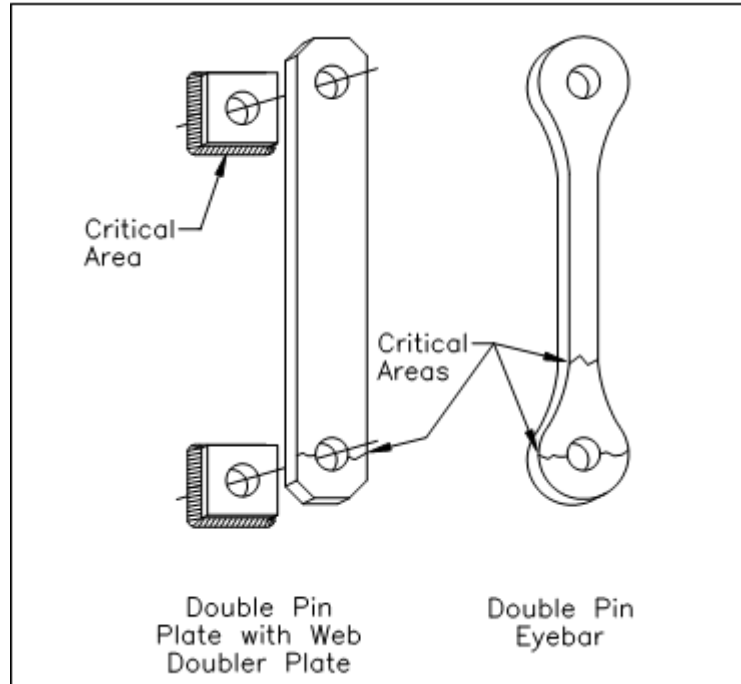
Fatigue cracks in pin assemblies
